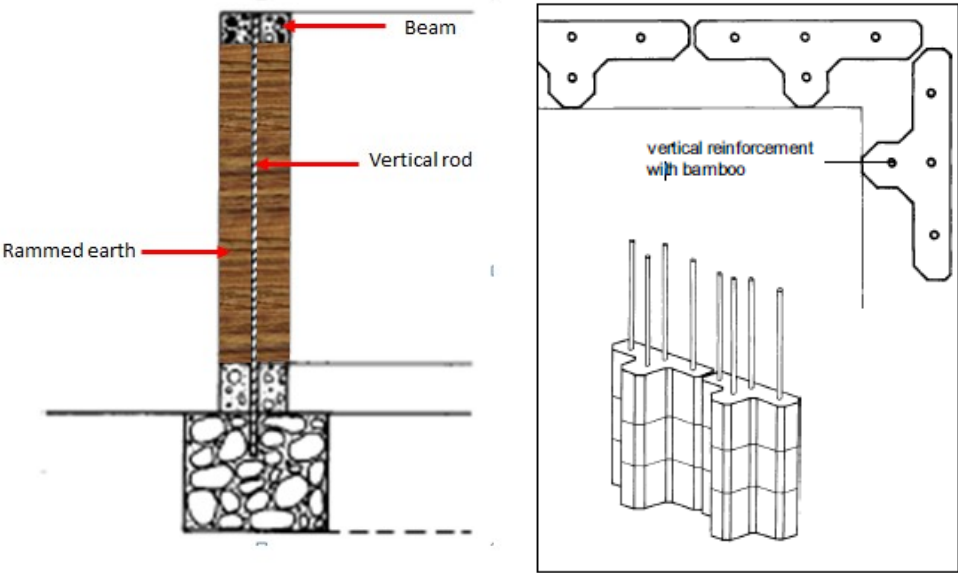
The use of vertical rods as reinforcement for rammed earth walls proposed by Minke, 2001
